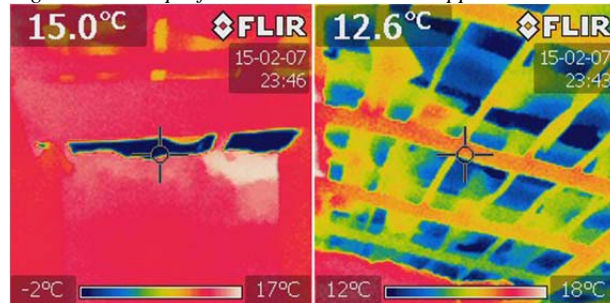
Gaps and cracks between the top of the wall and roof showing the poor construction of the roof.
